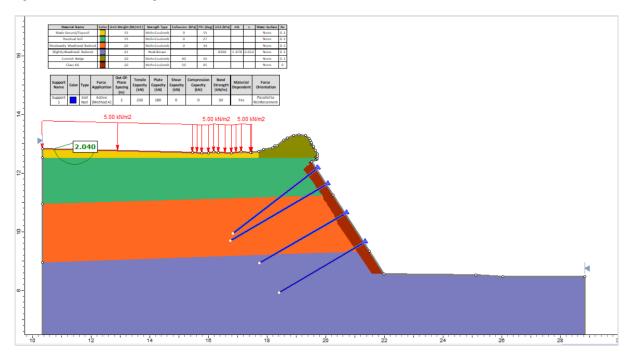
Section 2 – Facing Installation - BS8006 Set2
